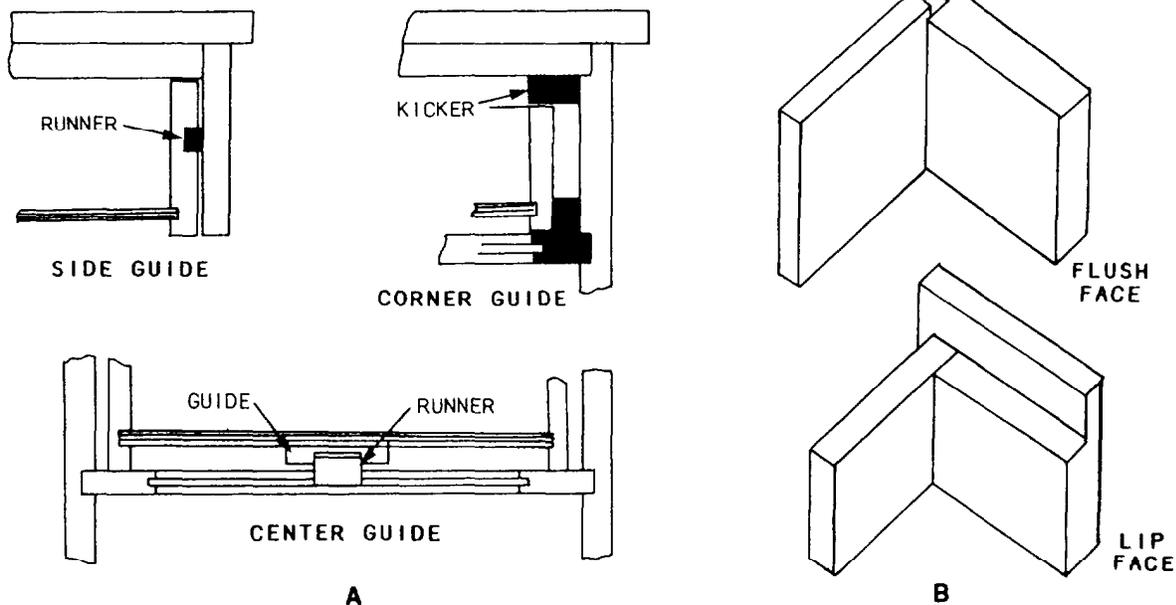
Types of drawer guides (view A) and faces (view B).
